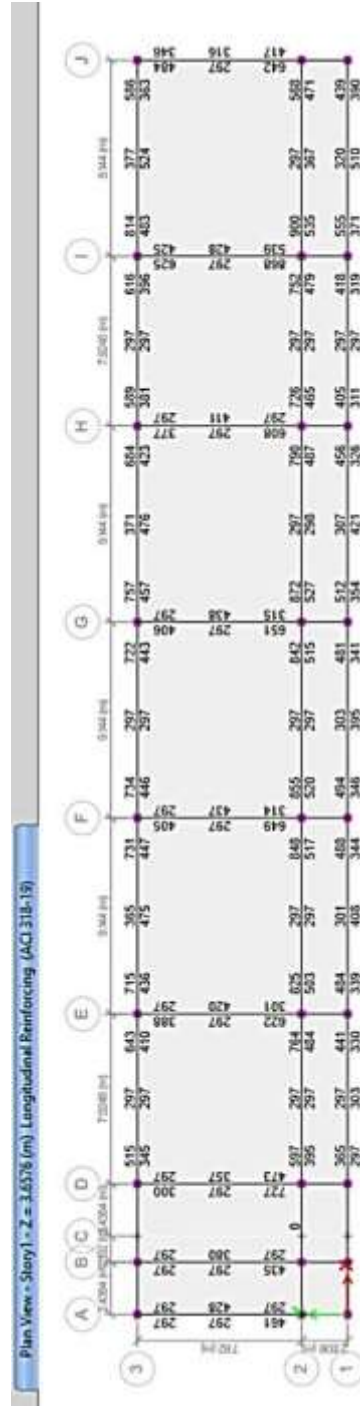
Longitudinal Reinforcement Area of 2nd floor beam
